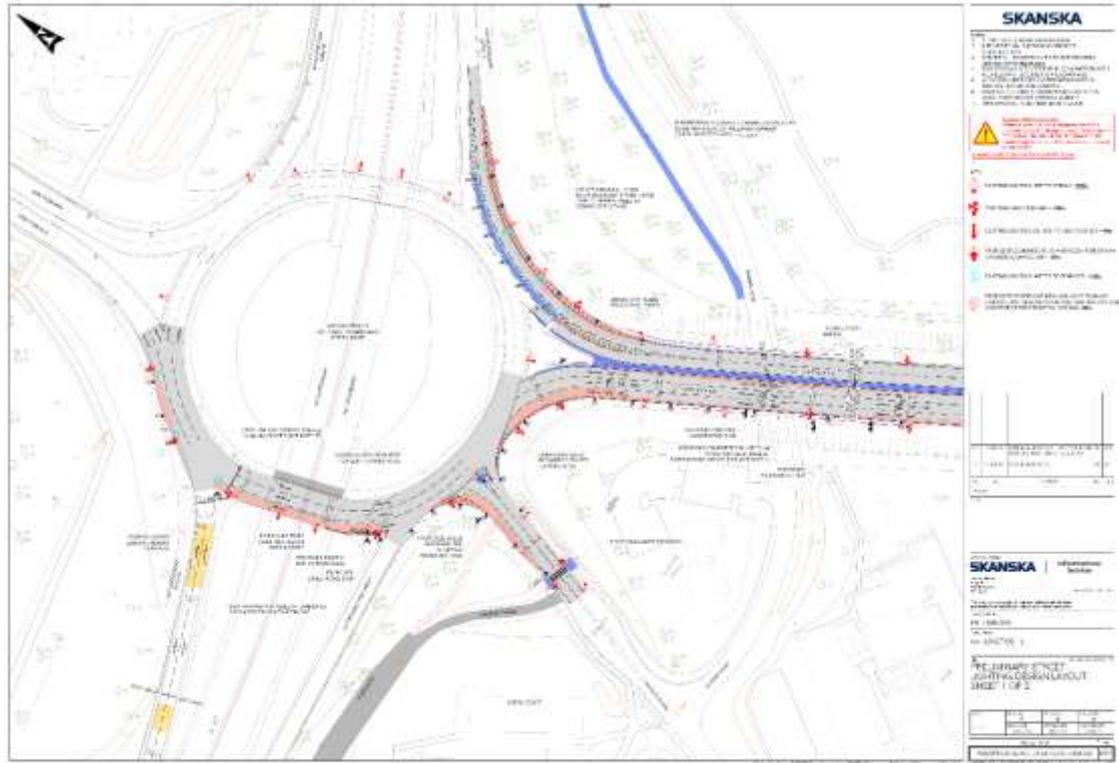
A1260 Nene Parkway Junction 15 Preliminary Design Scheme drawing (Northern section only)
